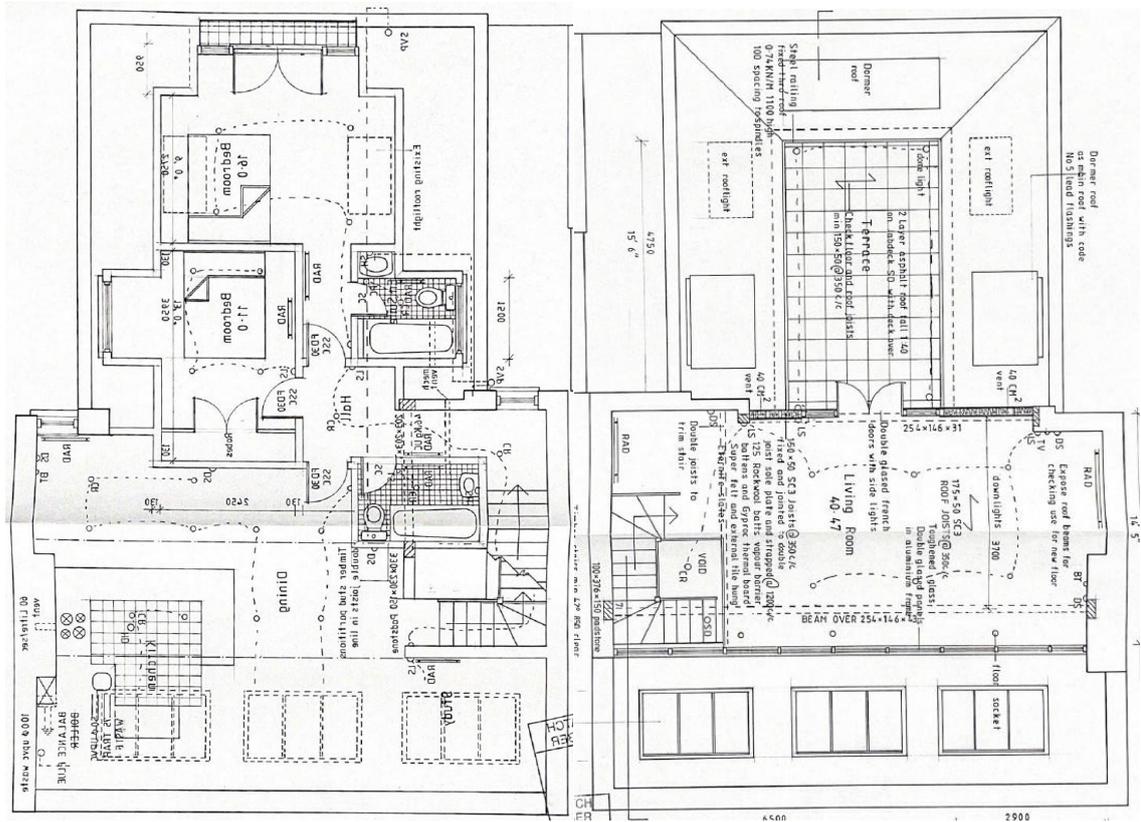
Approved layout at first floor within adjacent building (no. 17 to 18 Great Sutton Street) from Ref. P2016/0105/FUL
